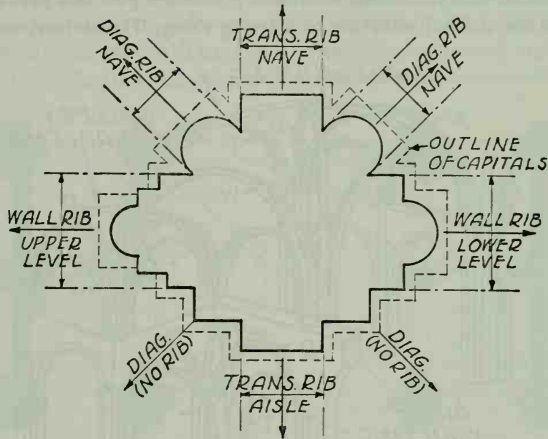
Milan. Sant' Ambrogio. Cross section through one of the larger compound piers.
